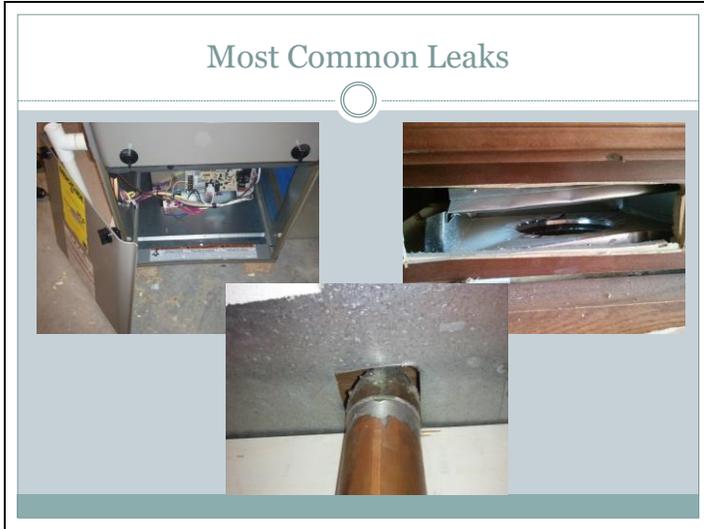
Furnace cabinet (for multiple position cabinets there is a removable plate – that plate is not sealed)
